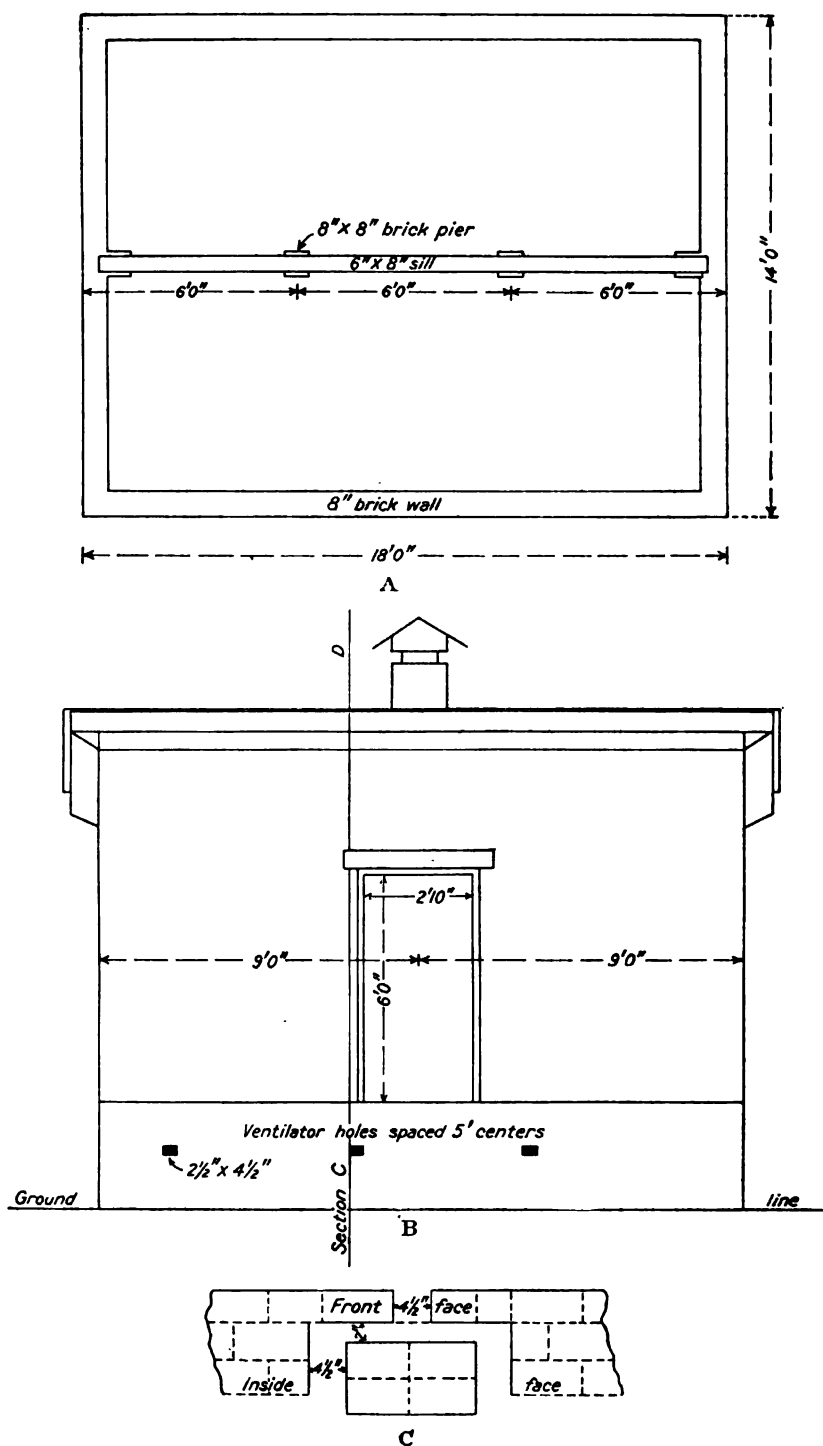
Foundation plan (A), front elevation (B), and plan of ventilator hole (C) of brick magazine.
